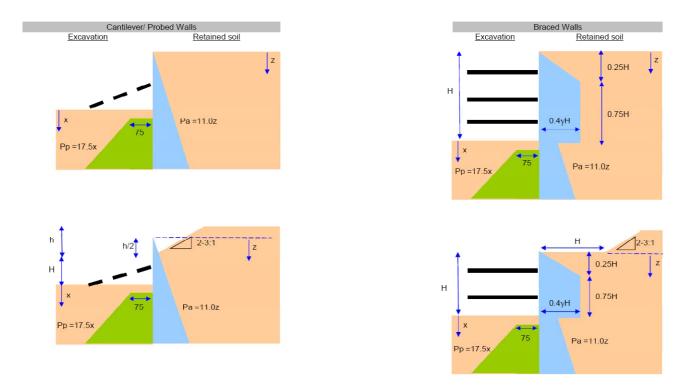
Lateral Earth Pressure for Temporary Shoring
